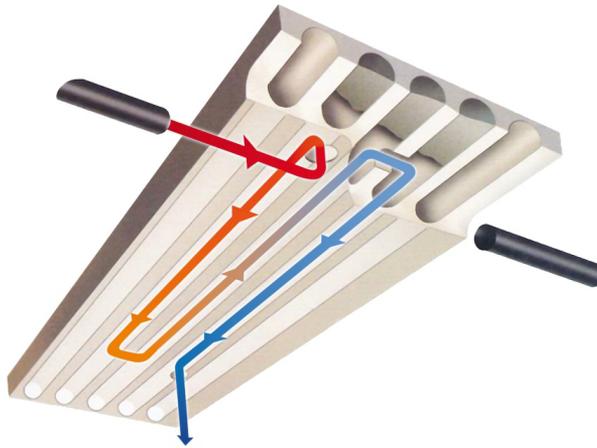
The principle of a ventilated hollow core slab, showing the air flowing through the slab (Strängbetong)
